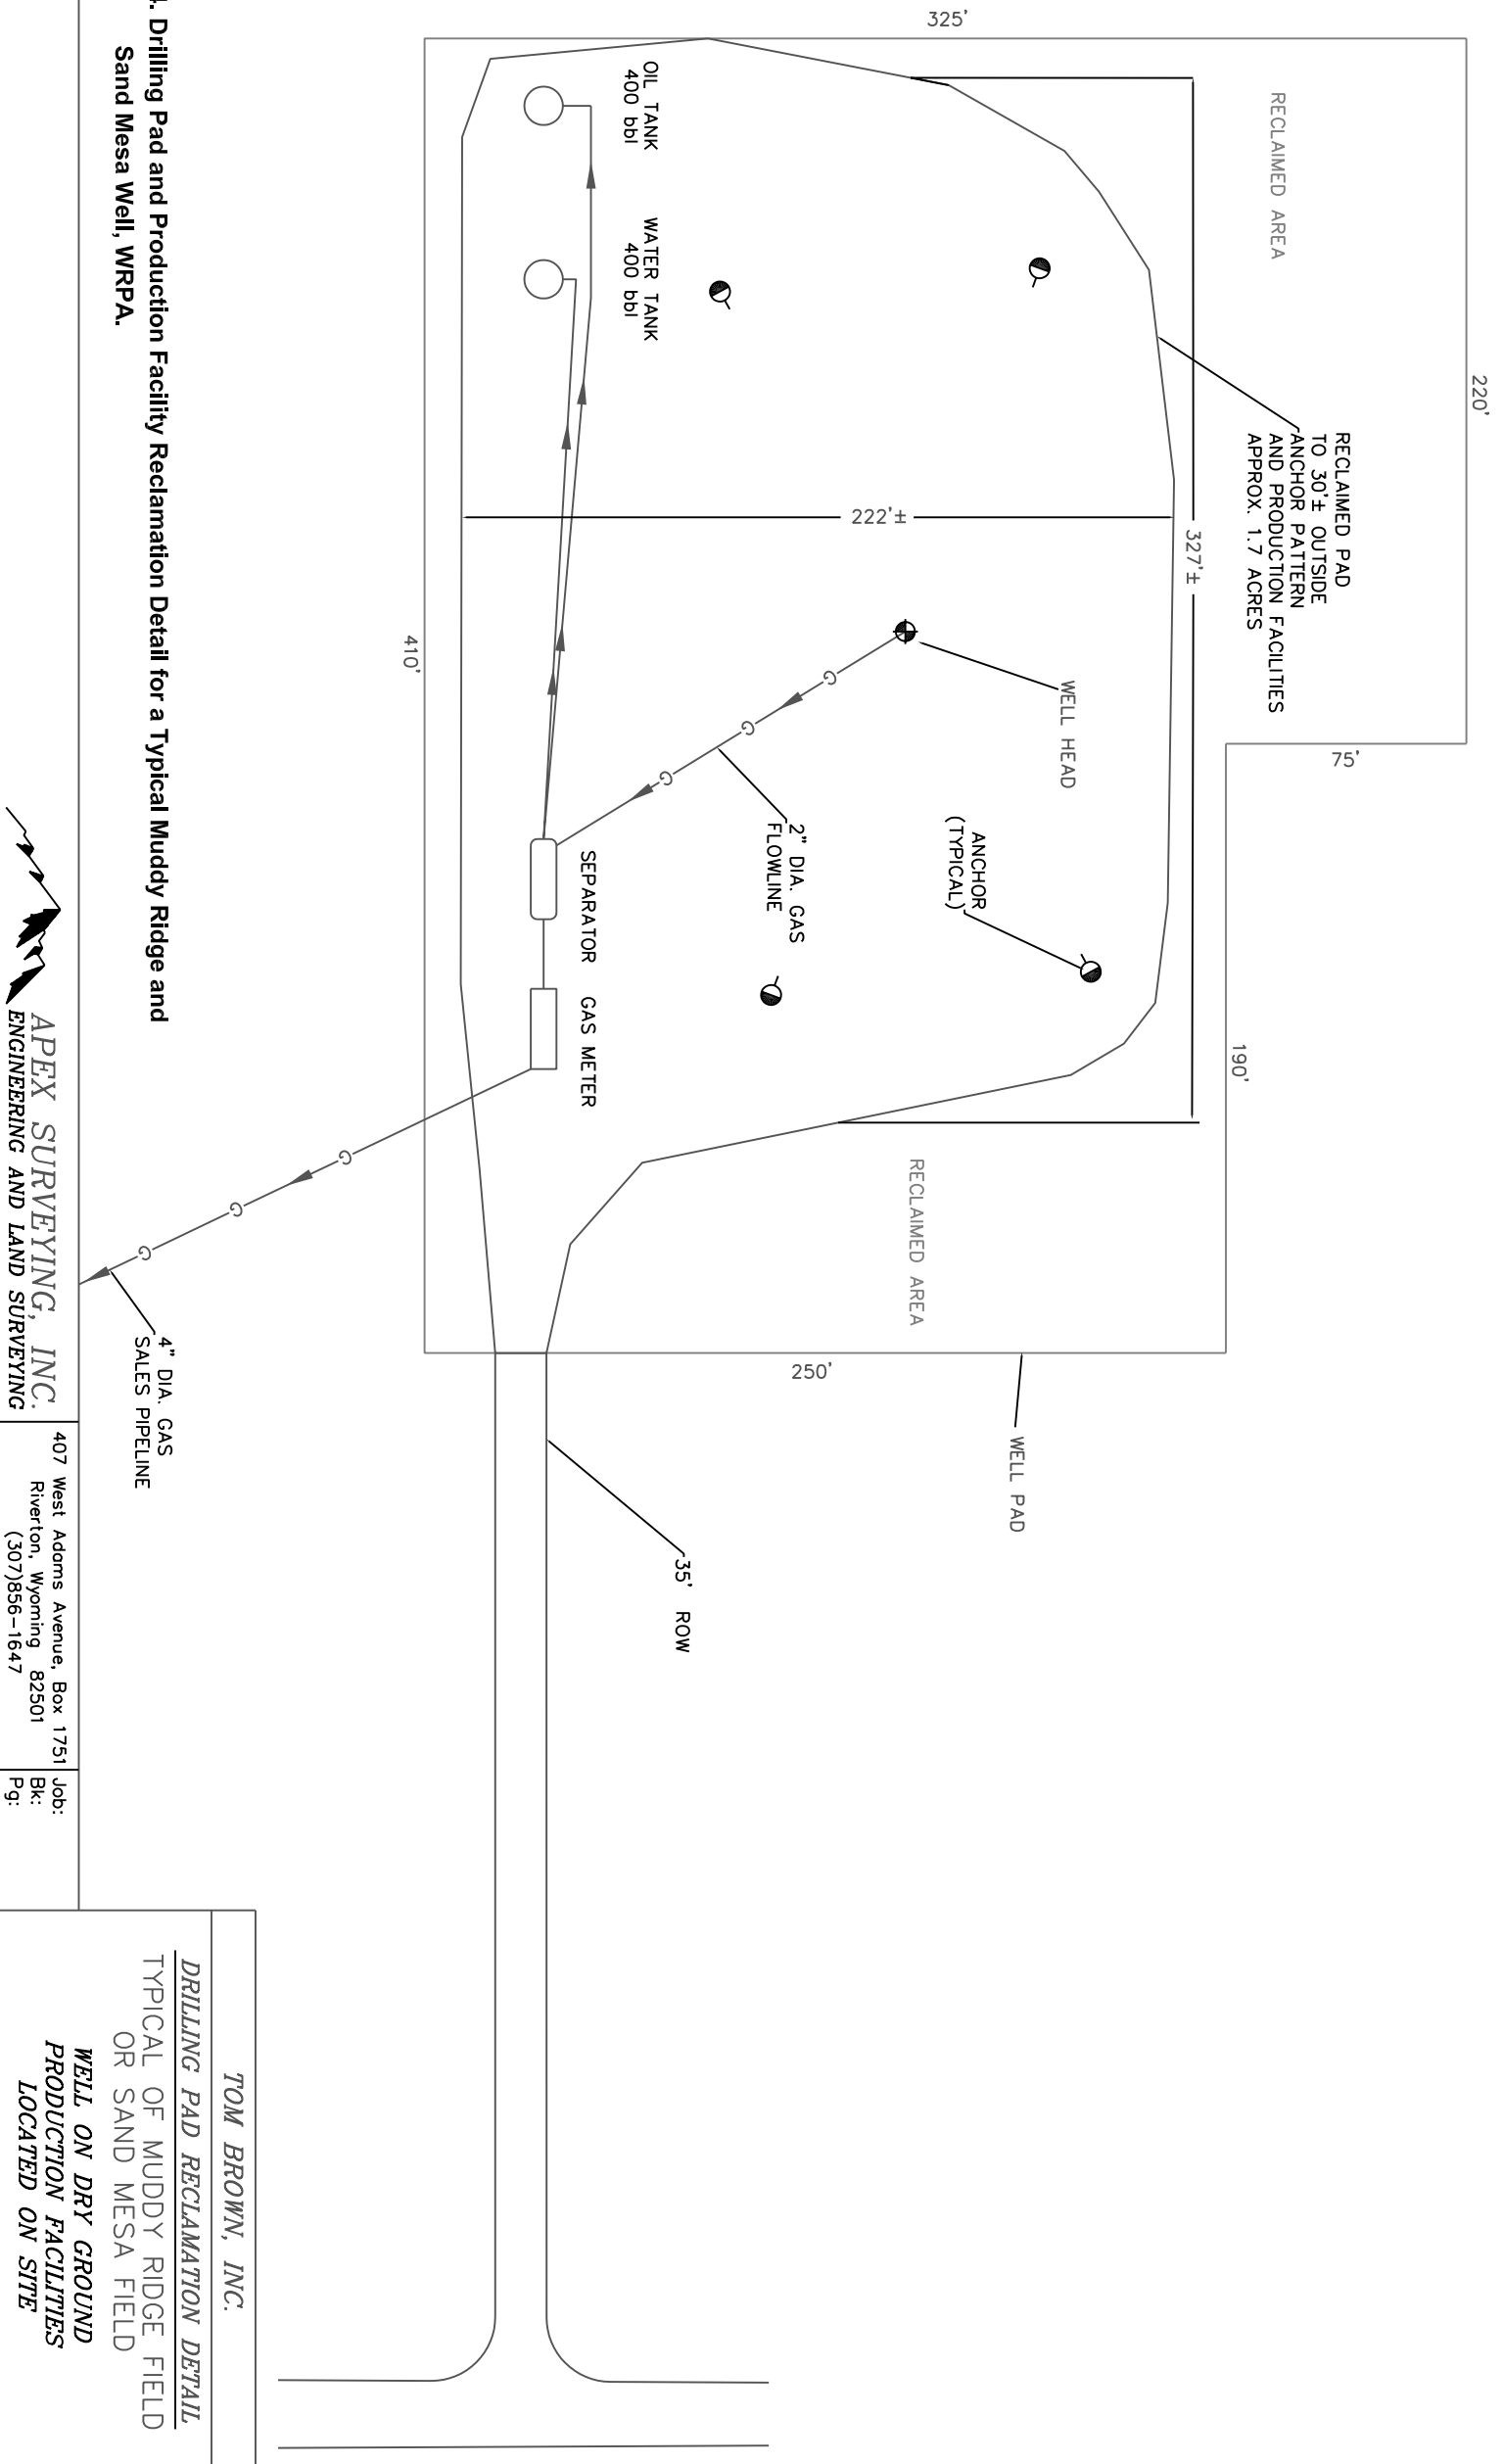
Drilling Pad and Production Facility Reclamation Detail for a Typical Muddy Ridge and Sand Mesa Well, WRP.
